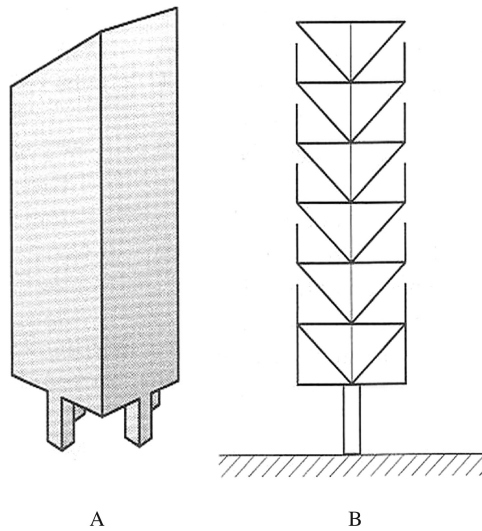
Building design of Citicorp Building in New York City. The building appears to float on four columns (A) using V-shaped beams to transfer forces (B).
